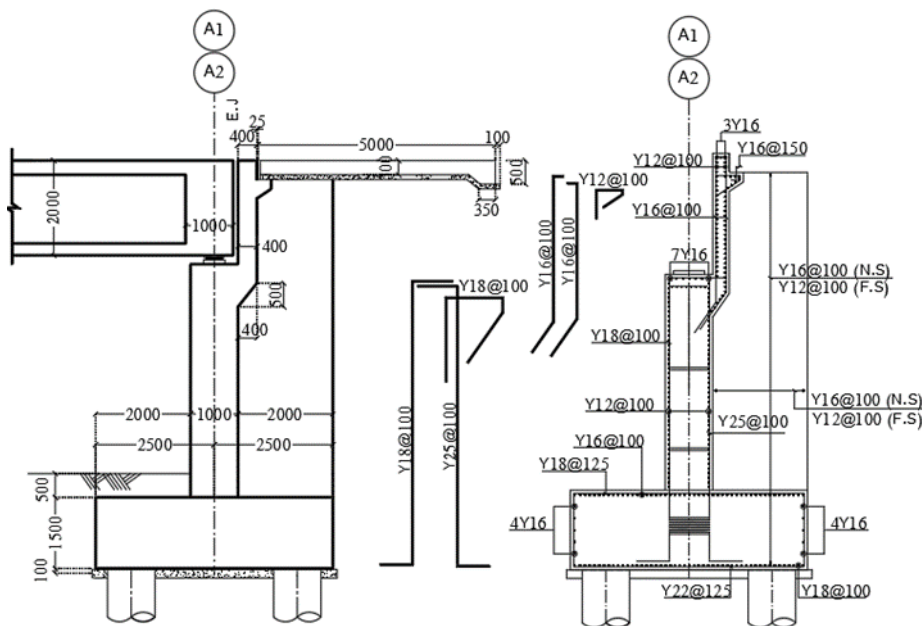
Reinforcement details of the abutment in longitudinal and transverse directions.
